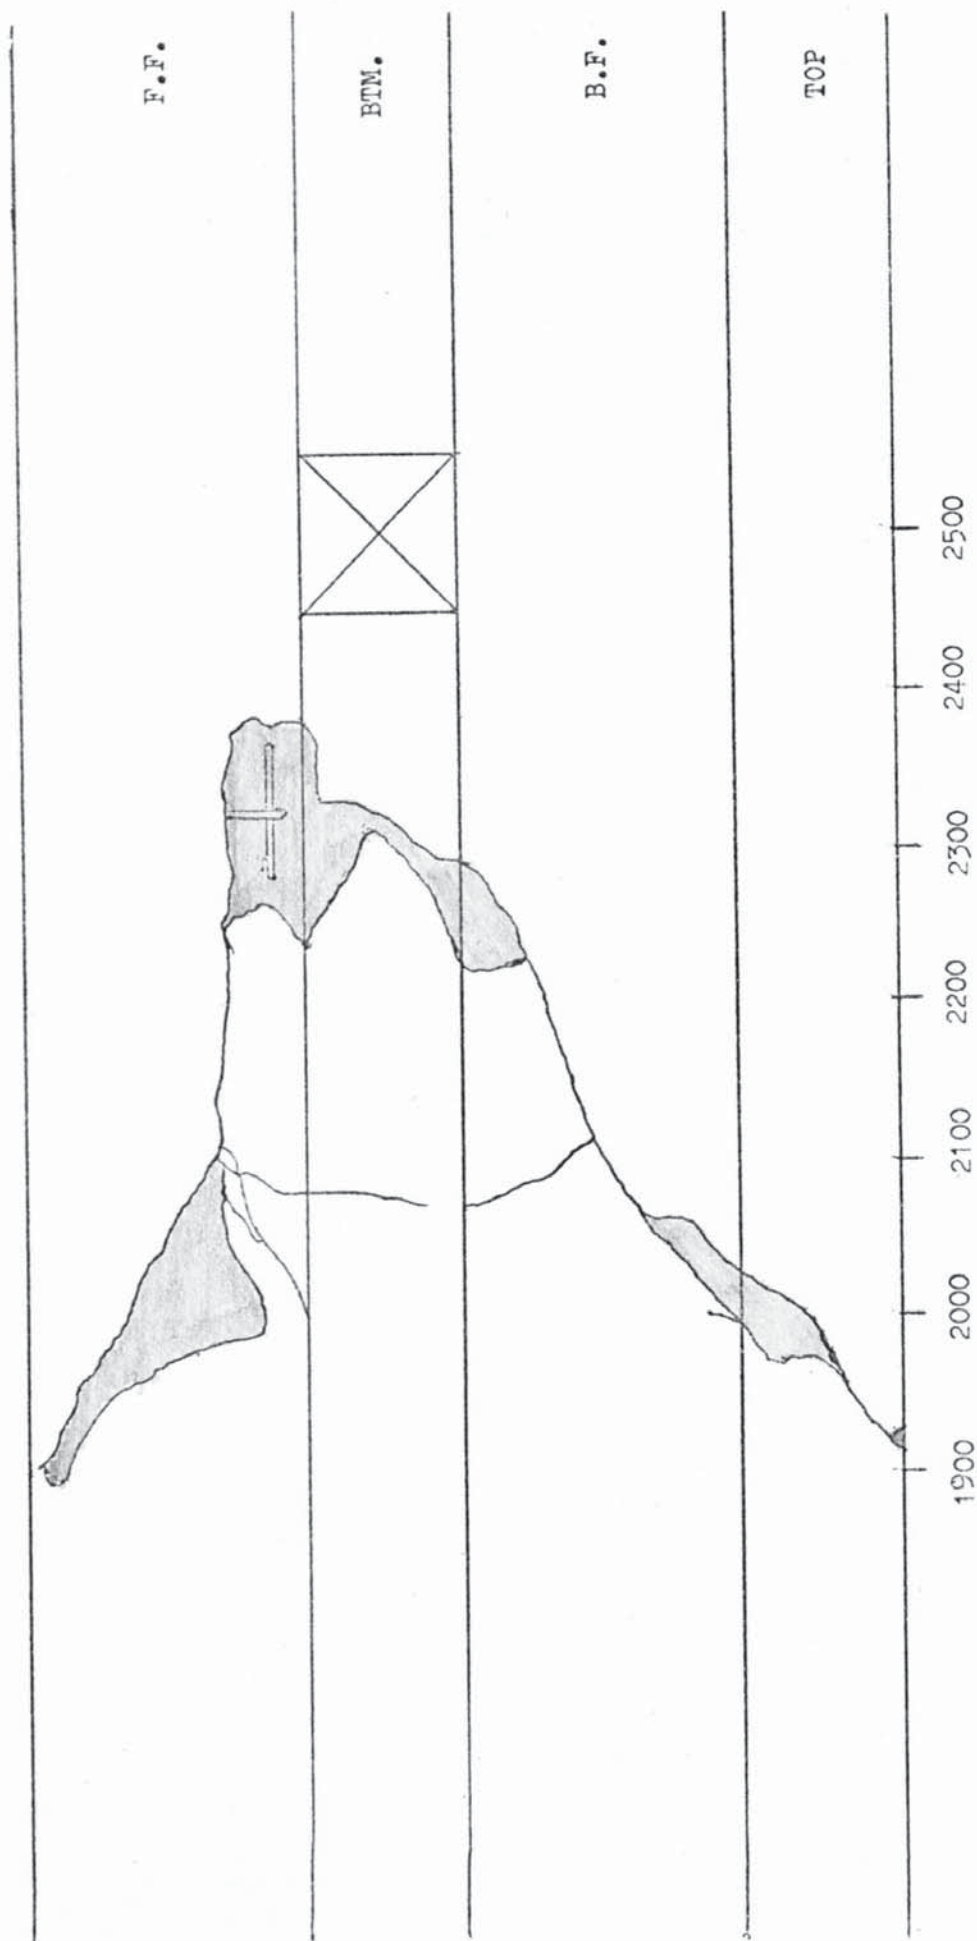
FAILURE CRACK PATTERNS - BEAM 5 ( MODE 2 )
